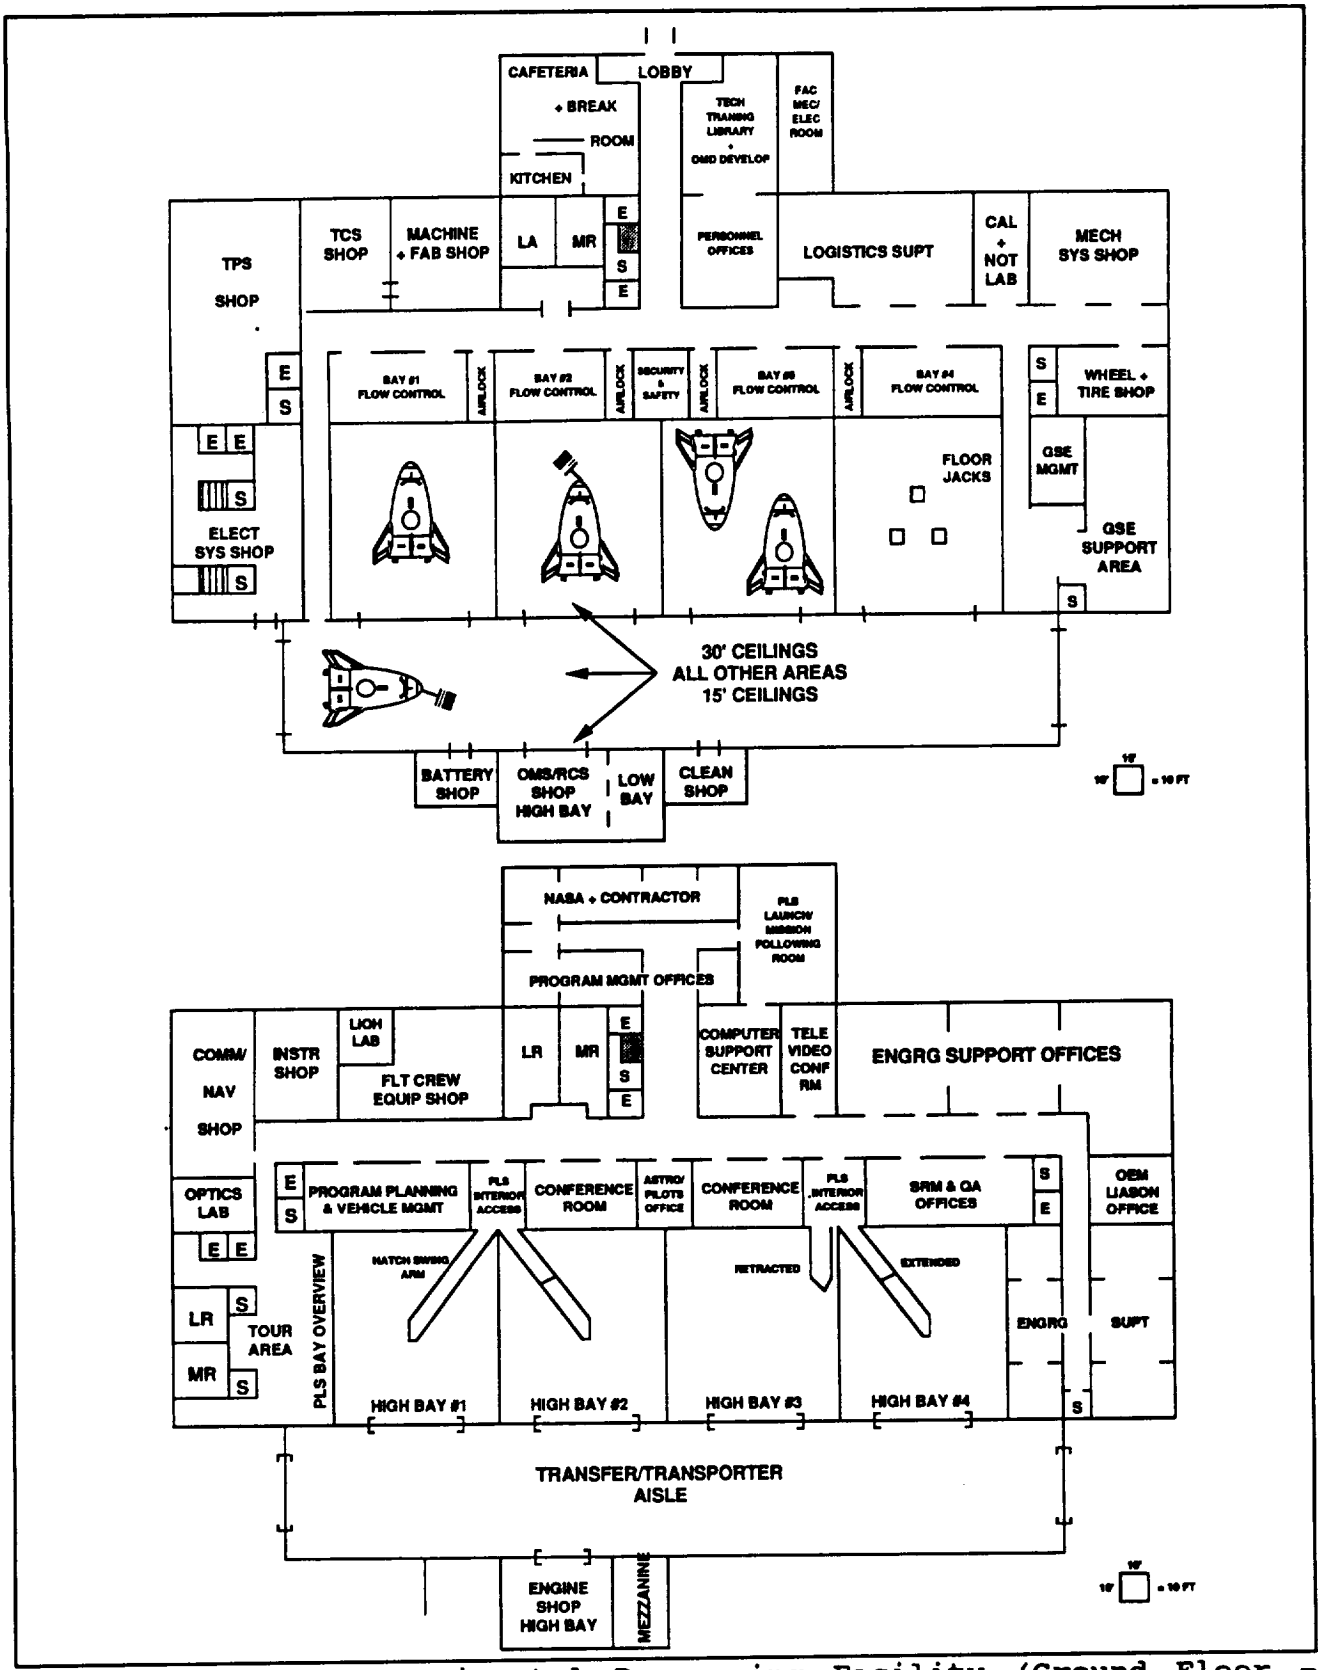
PLS Horizontal Processing Facility (Ground Floor - Upper; Second Floor - Lower)
